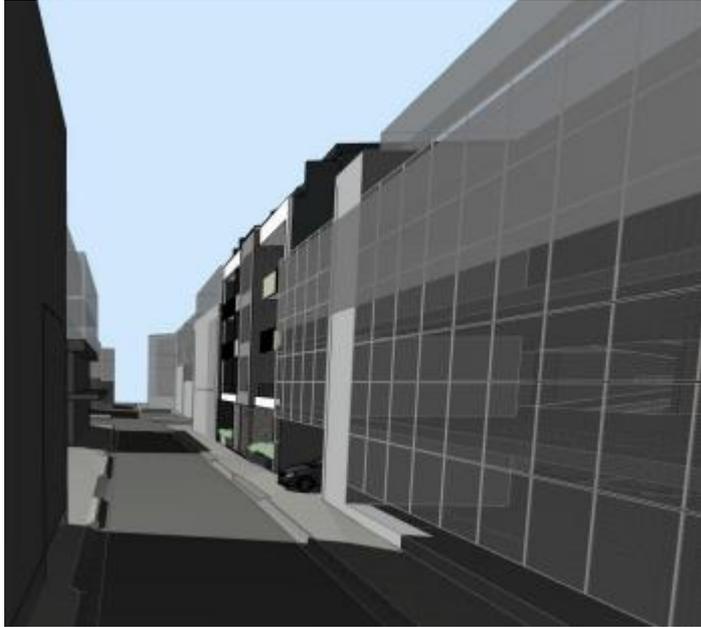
Photomontage of the proposed development as viewed from Bungan Lane (Source: Gartner Trovato)
